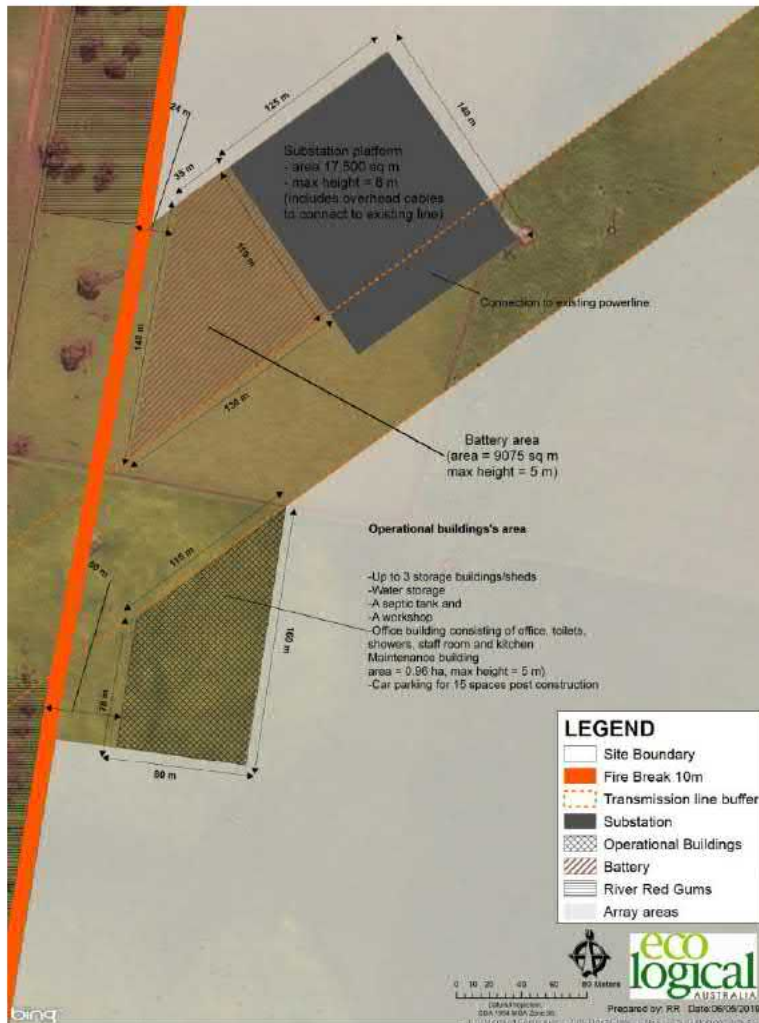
Indicative Substation layout (Source: Amended Plans Diagram 2 prepared by Ecological Australia 09 May 2019)
